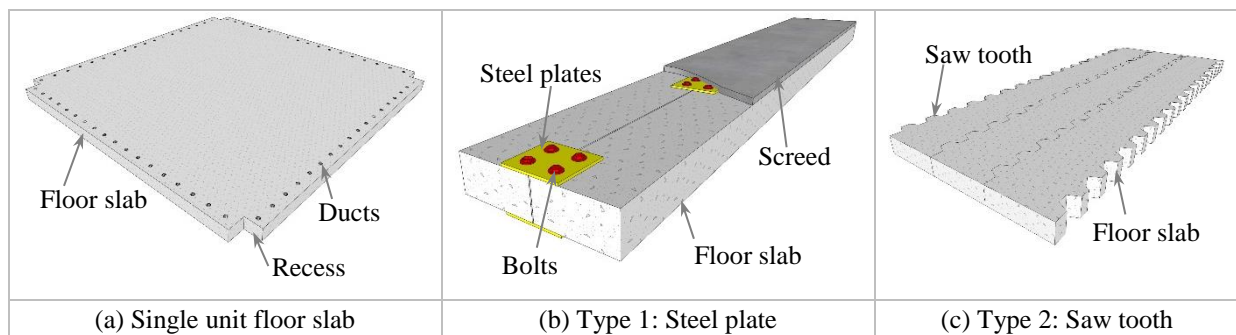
Schematic layout of possible types of removable floor to floor connections
